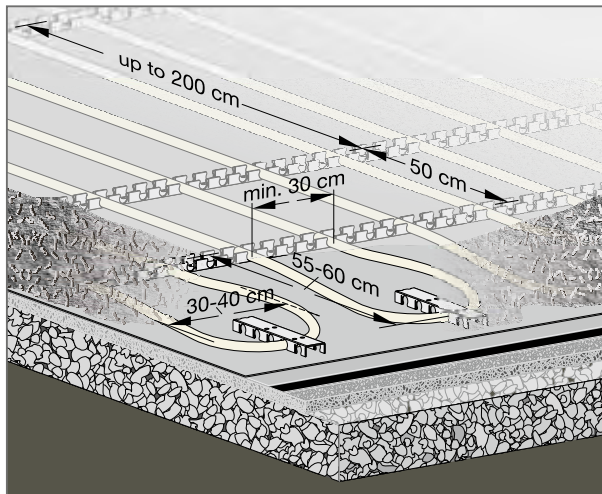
Mounting on clamping rail, e.g. Fonterra pipe 25x2.3mm
